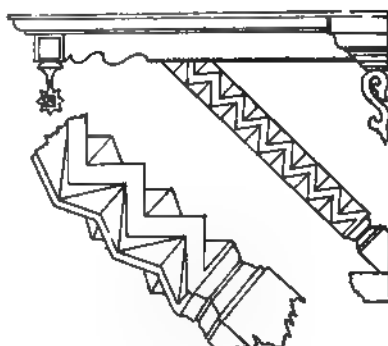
BRACKET DETAIL—CANTON-BERNE.
